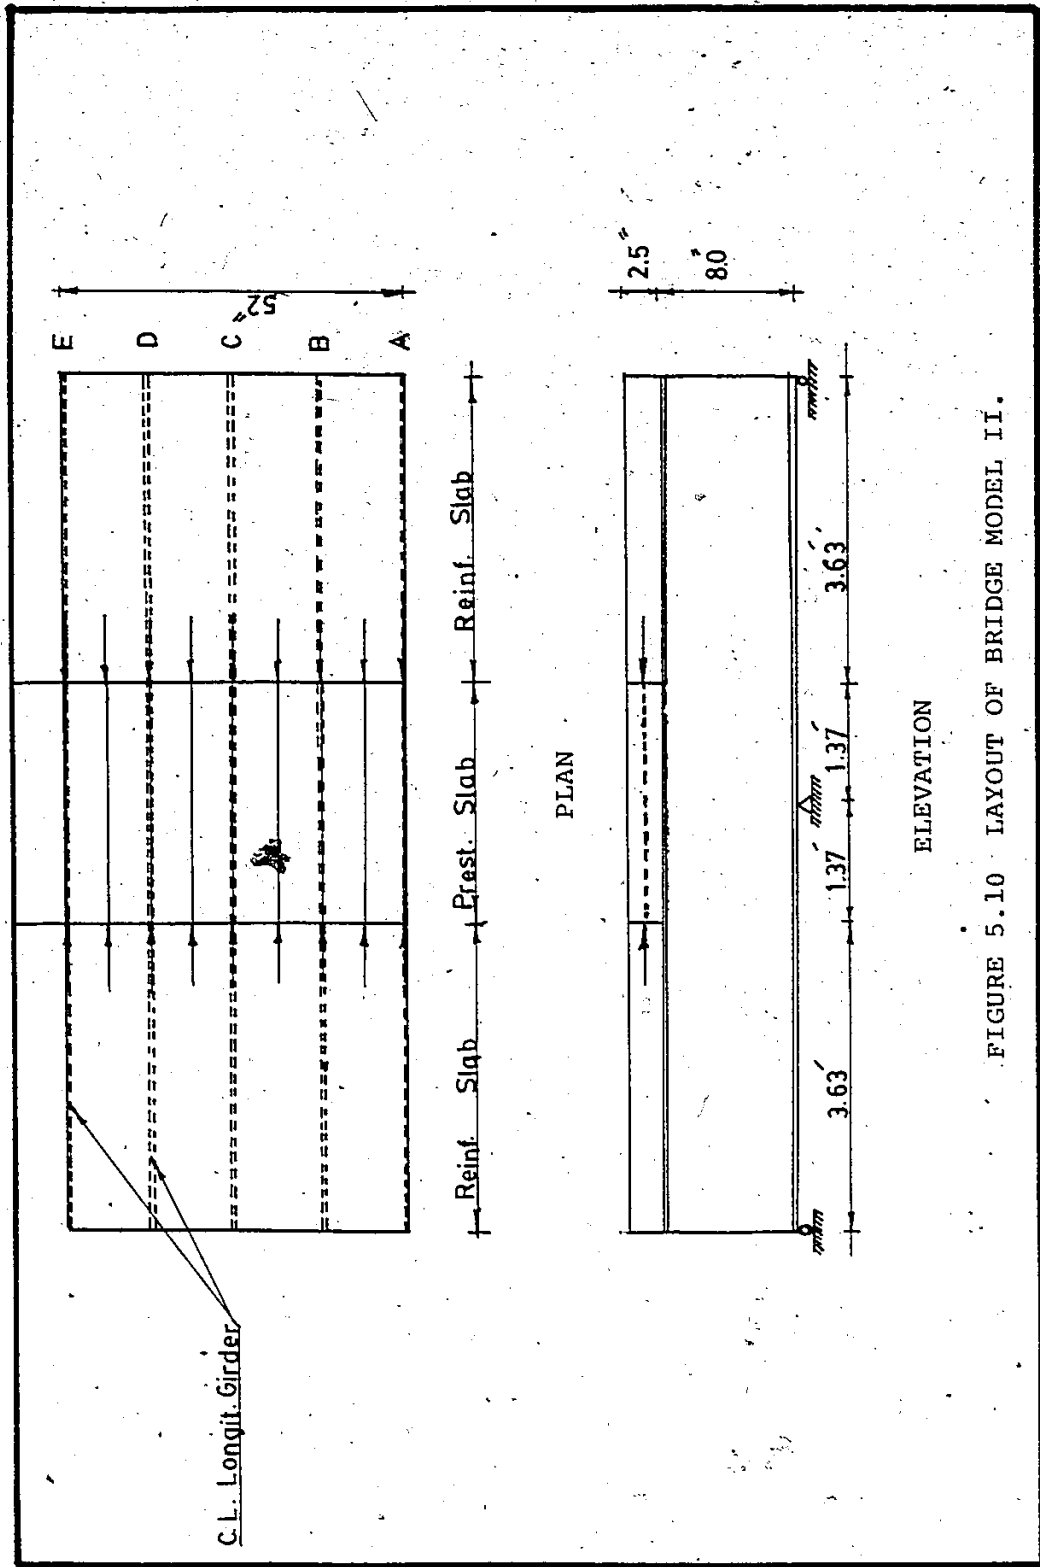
LAYOUT OF BRIDGE MODEL II.
